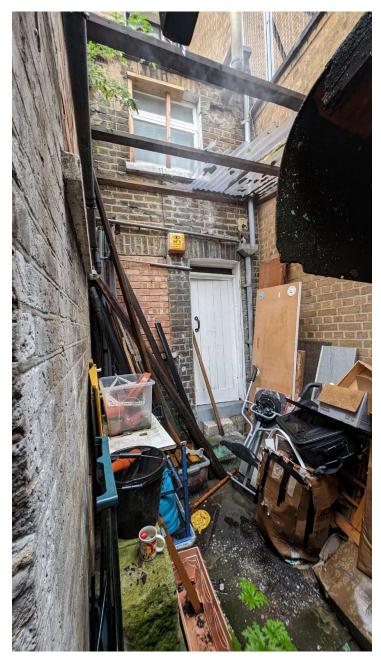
Photograph of the rear patio door that is proposed to be replaced with a new door with lowered cill and larger fanlight above and no external steps
